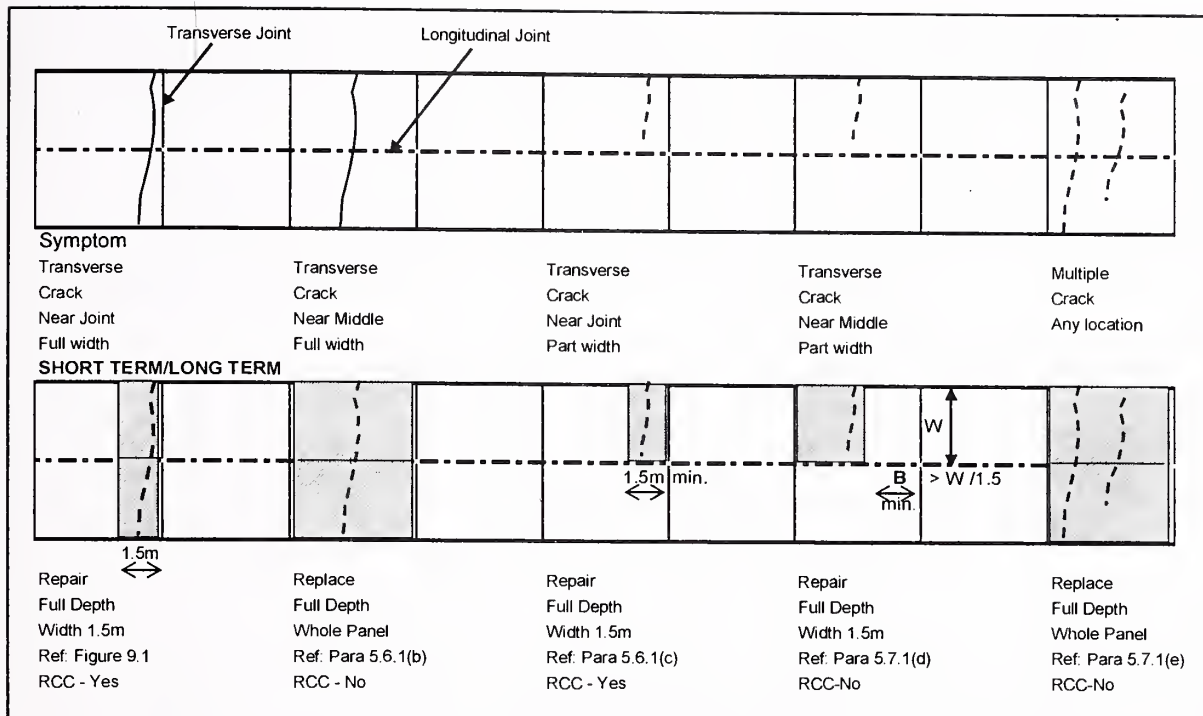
Recommended Layout for Transverse Cracks Repairs – Plan View
